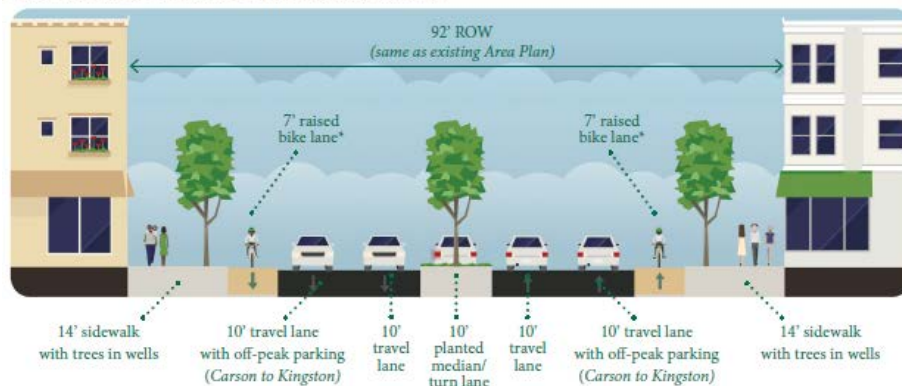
South Tryon Segment 1 Proposed Section (Long term)
